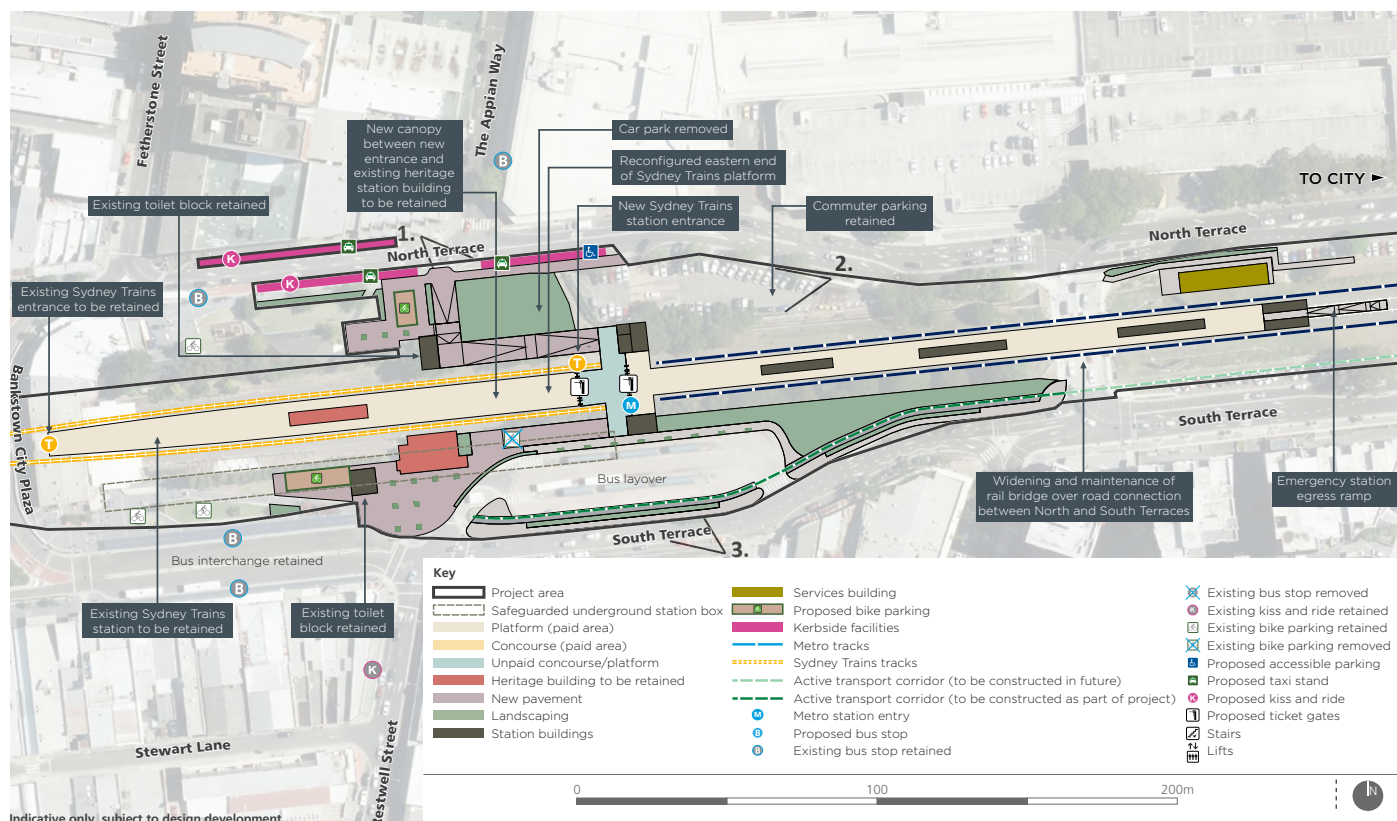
VIEWPOINT LOCATION PLAN
